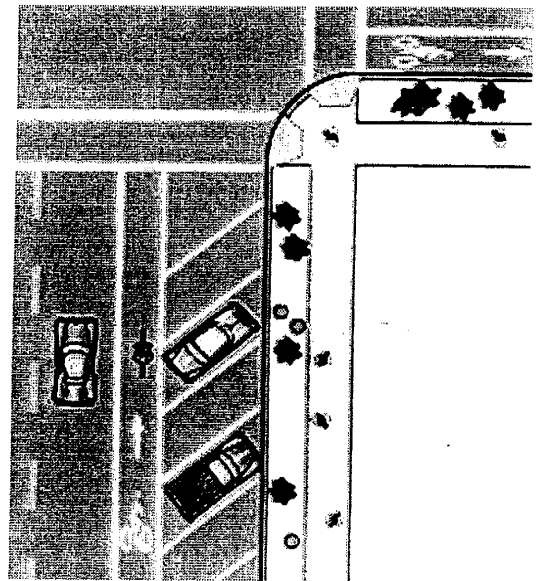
Aerial view of a bike lane and diagonal parking. (Source: Oregon Department of Transportation)
